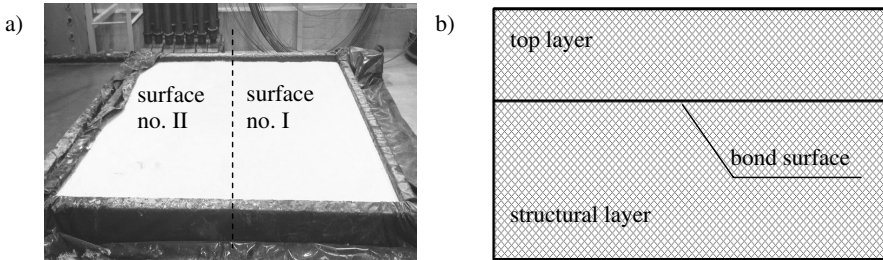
Concrete floor: a) view of structural layer before top layer concreting, b) cross section through concrete floor layers.
